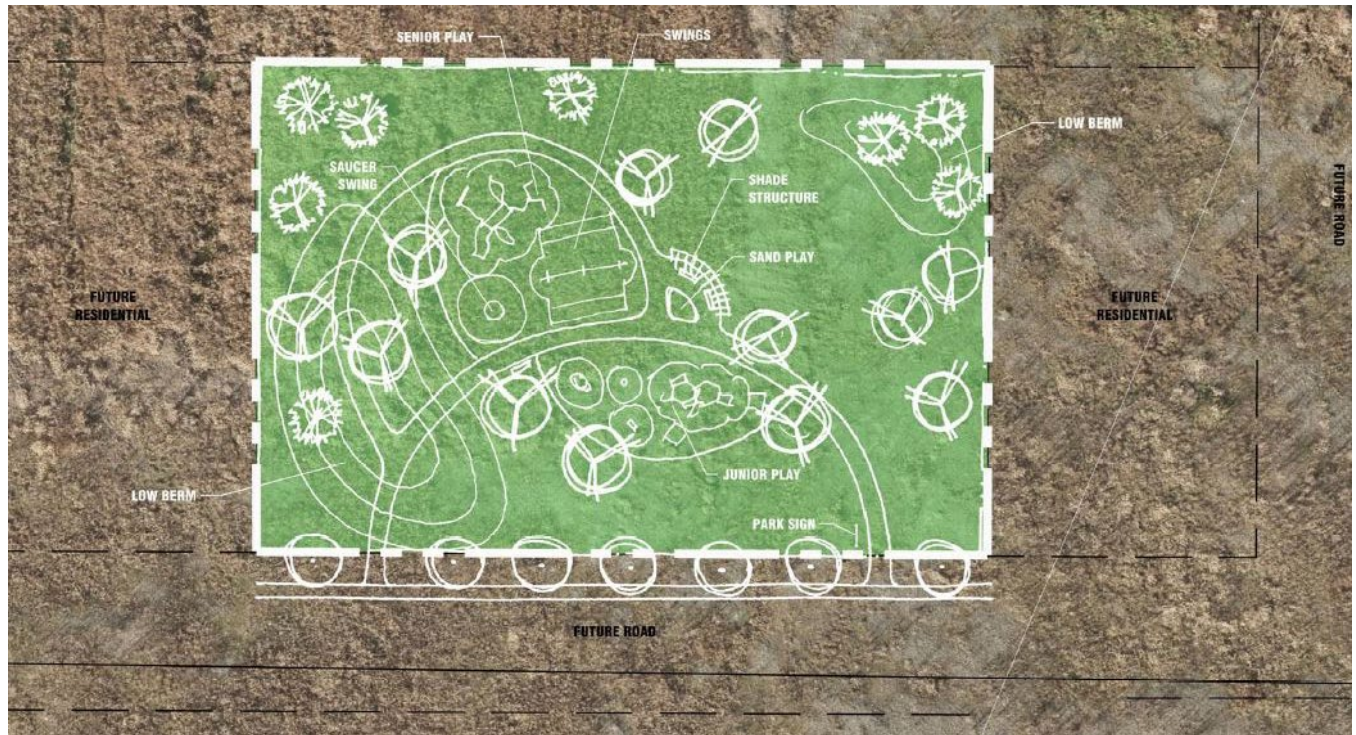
Preliminary Facility Fit Plan for the Proposed Parkette.
